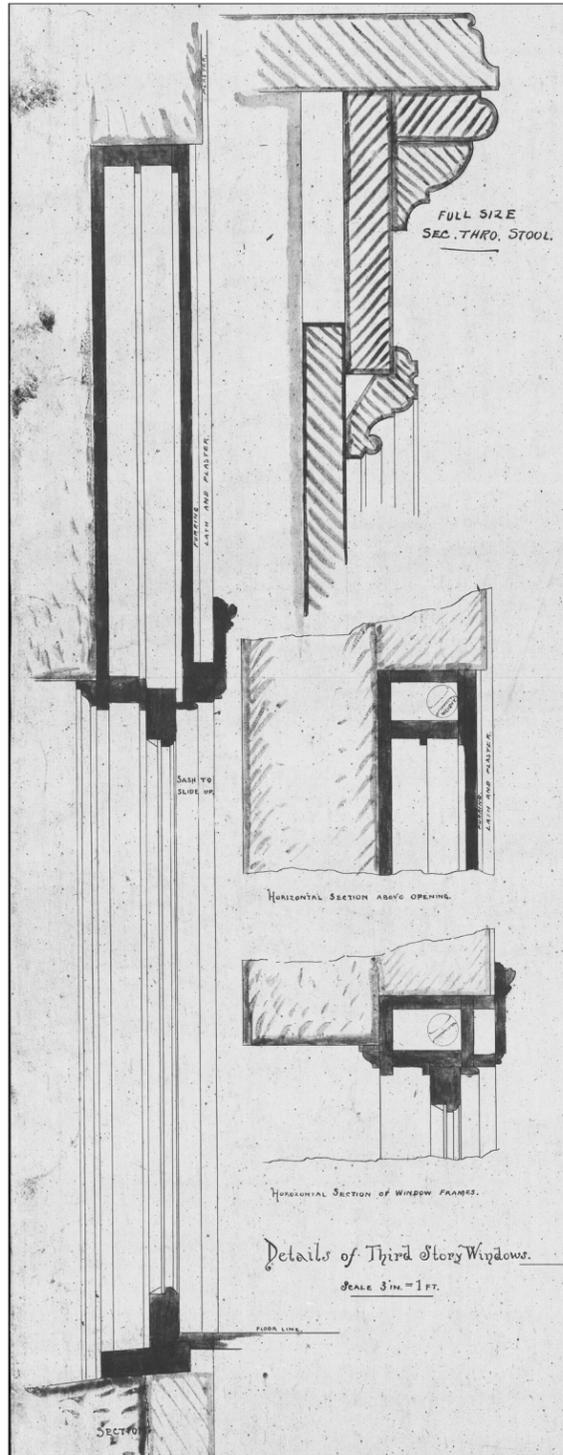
Architectural Section Drawing, ca. 1888. The drawing shows sash pocket at typical Third Floor window openings.
